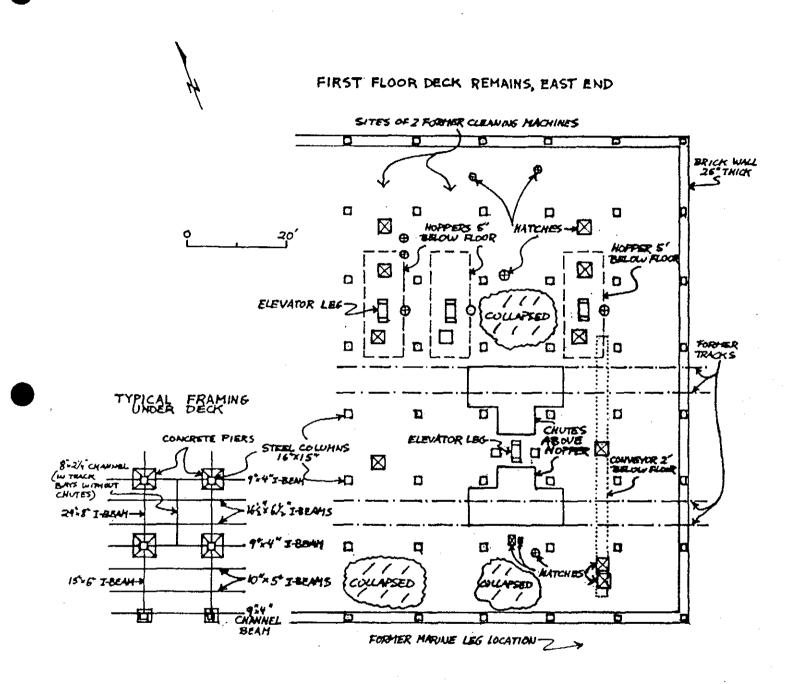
TYPICAL SURVIVING PIER 7 GRAIN ELEVATOR REMAINS
